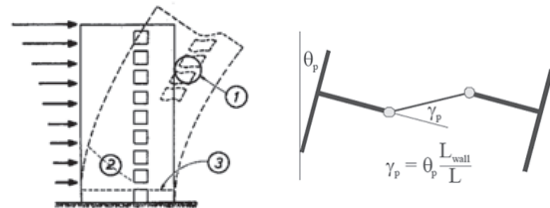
The Distortions in a Laterally Loaded Coupled Shear Wall
